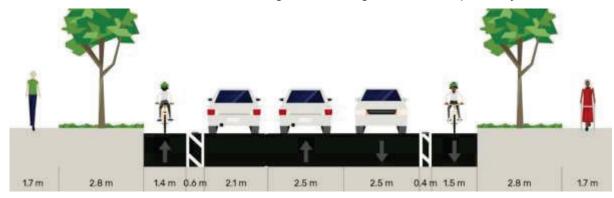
Previously Endorsed Cross Section – The Grove to Rennie Street
